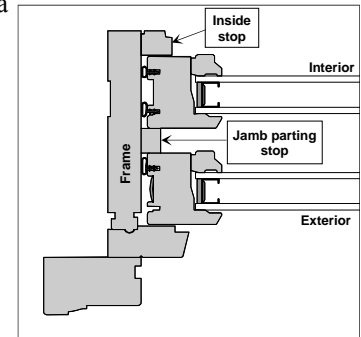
Remove parting stops; horizontal cross-section; sash and jamb liners shown for reference
